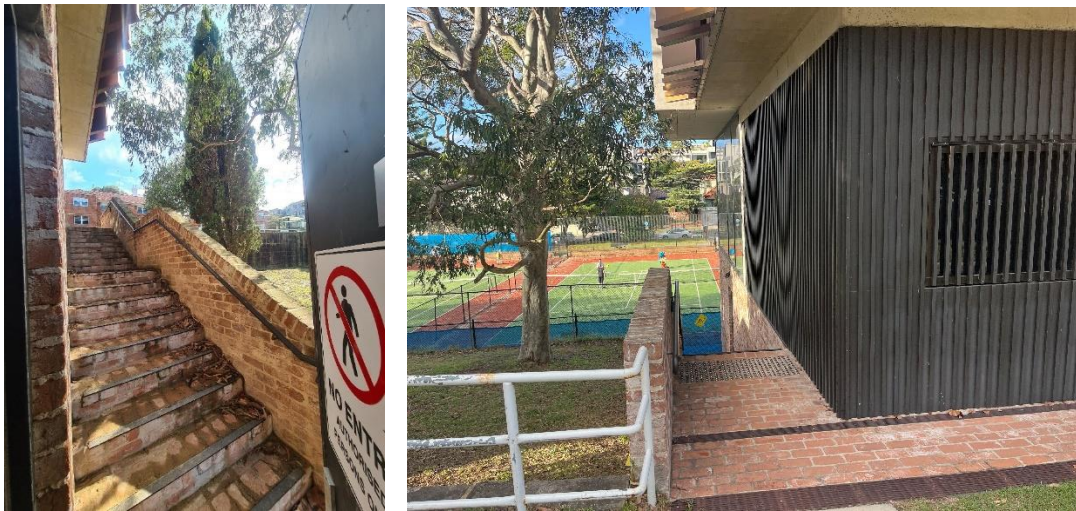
Photo of the proposed gym area looking to the west - 54B Bream Street, Coogee (Source: Randwick City Council)
